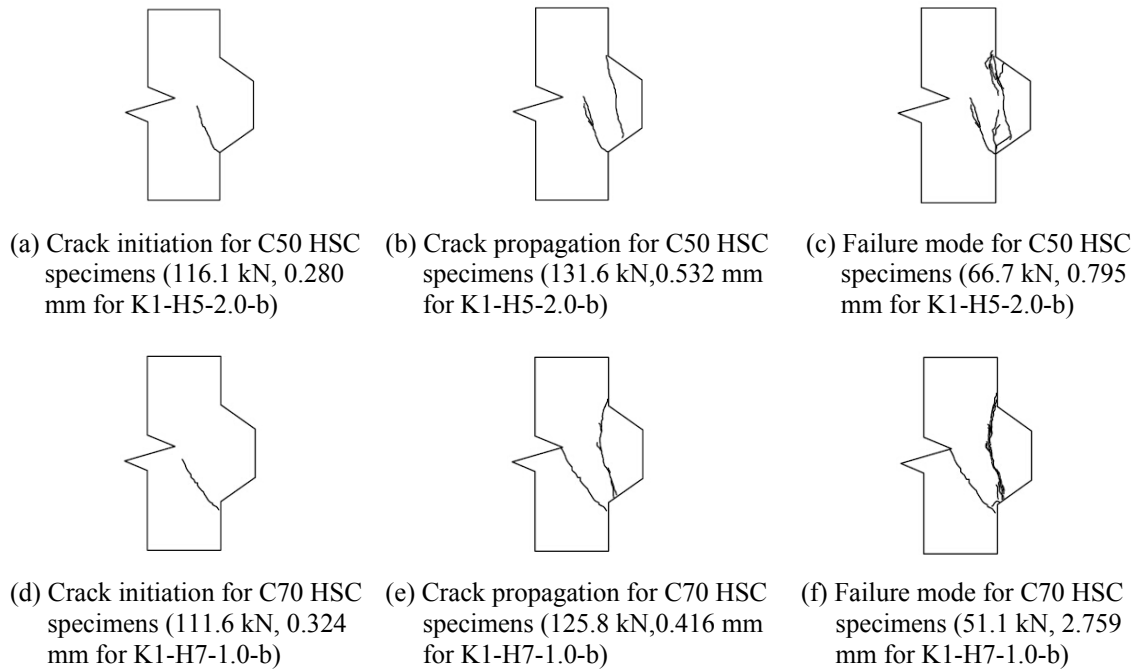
Sketches of cracking patterns of single-keyed dry joint specimens
